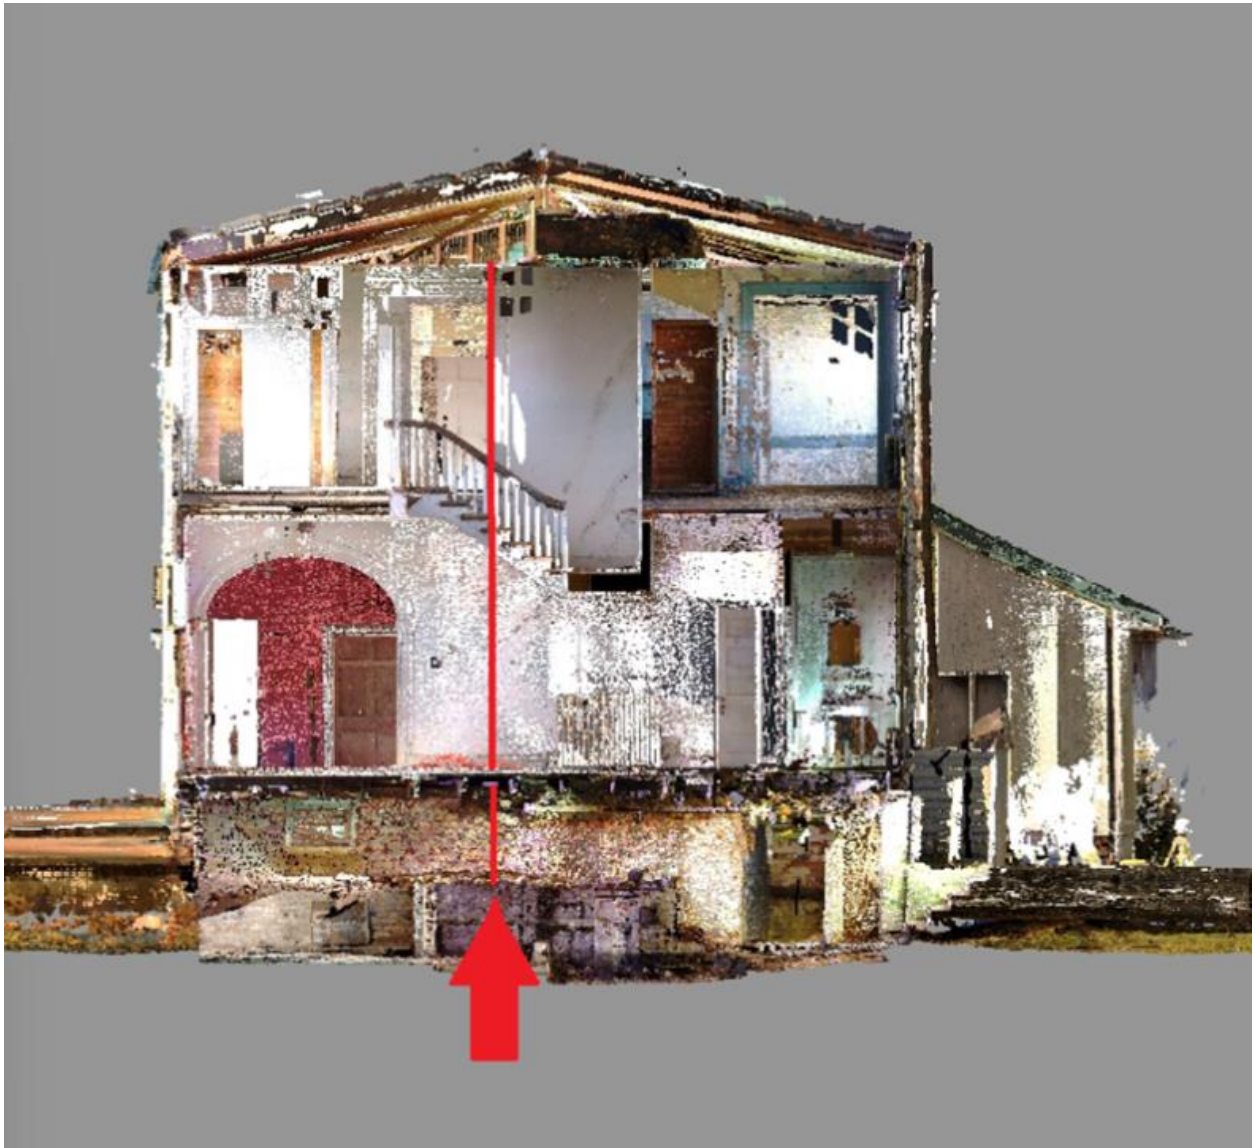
A section perspective view looking at the break in the cellar wall in relationship with the spaces above it. By drawing a line from that break straight up to the second floor, it is found that that break aligns with a wall on the second floor.
